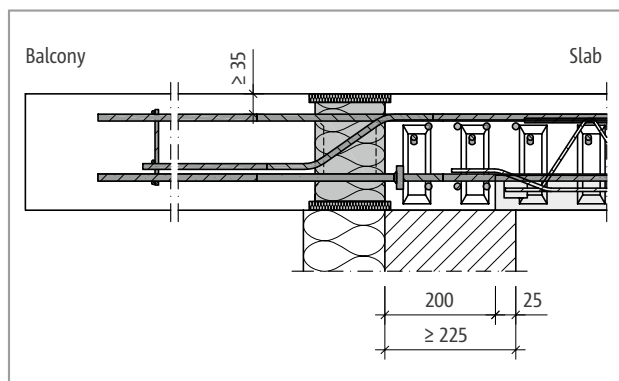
Schöck Isokorb® XT type C: Prefabricated slab without edge support with TICS (section XT type C-L-CV35, view XT type C-R-CV50)
